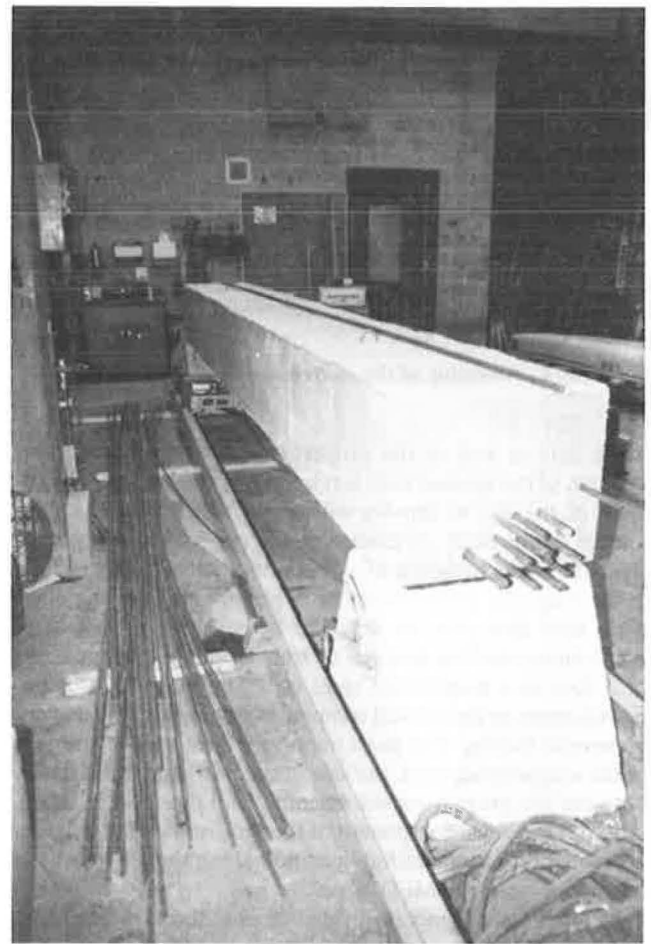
Concrete beam for tests of flawed steel bar and cable specimens.
